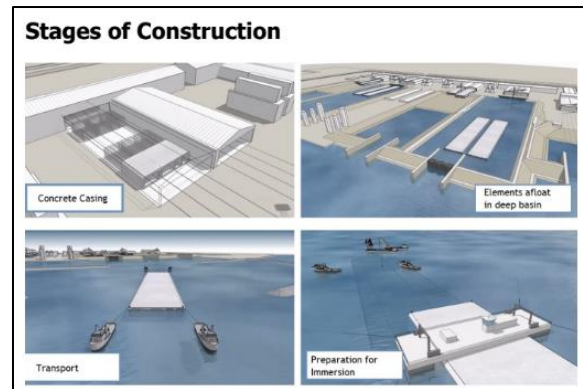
Immersed Tube Tunnel Stages of Construction Part 1 (Immersed tube tunnel (n.d.)).
